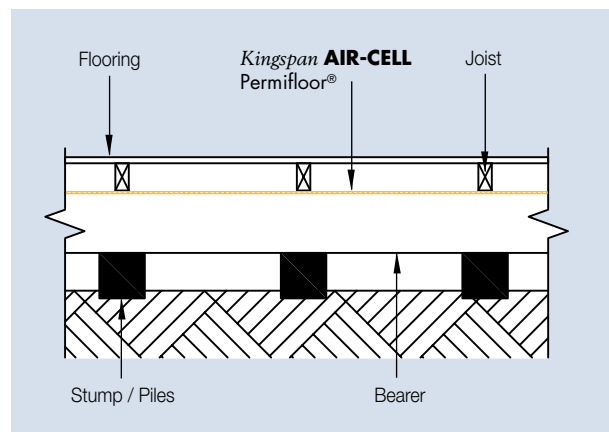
Side elevation of Kingspan AIR-CELL Permifloor® in a suspended framed floor
